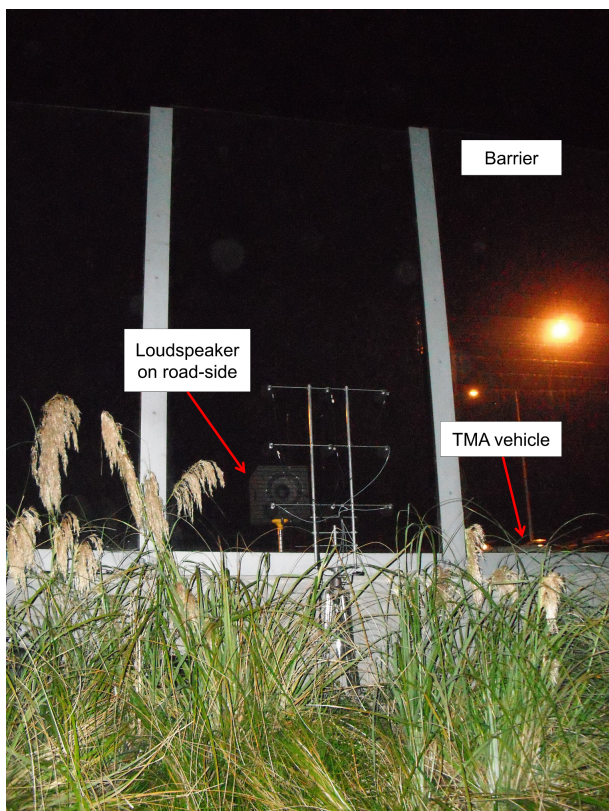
Semi-static closure site layout, St Marys Bay
